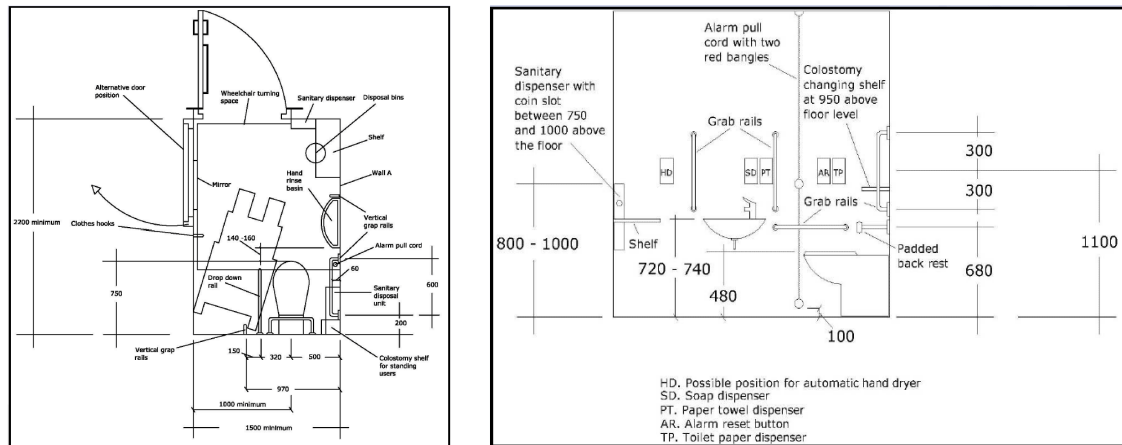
Accessible toilet "Plan, and Elevation" [73].
